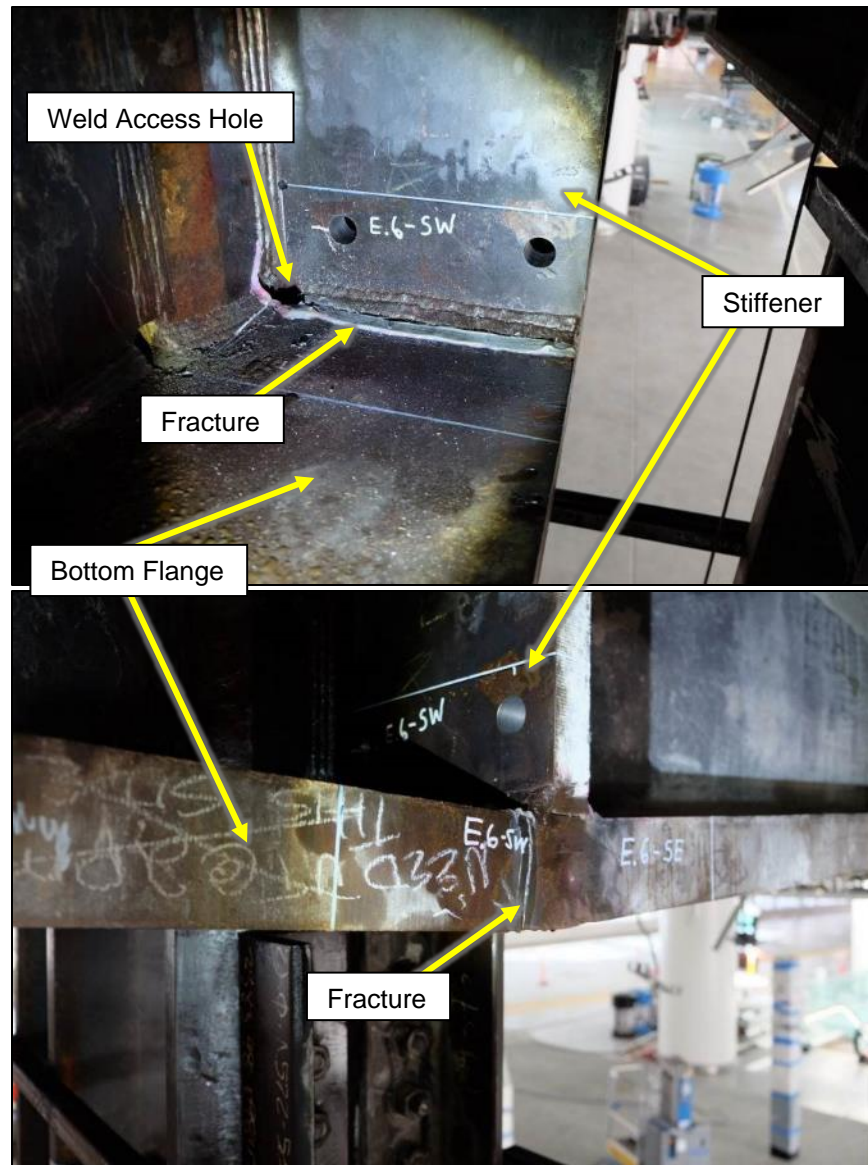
South side girder fracture, where the fracture was protected with silicone prior to flange sample removal.
